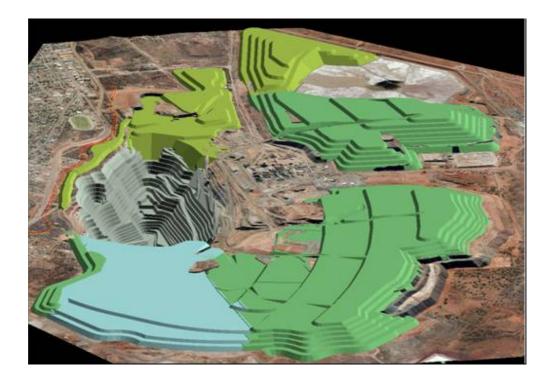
Proposed Final Open Pit and Waste Rock Dump Landforms in 2017
